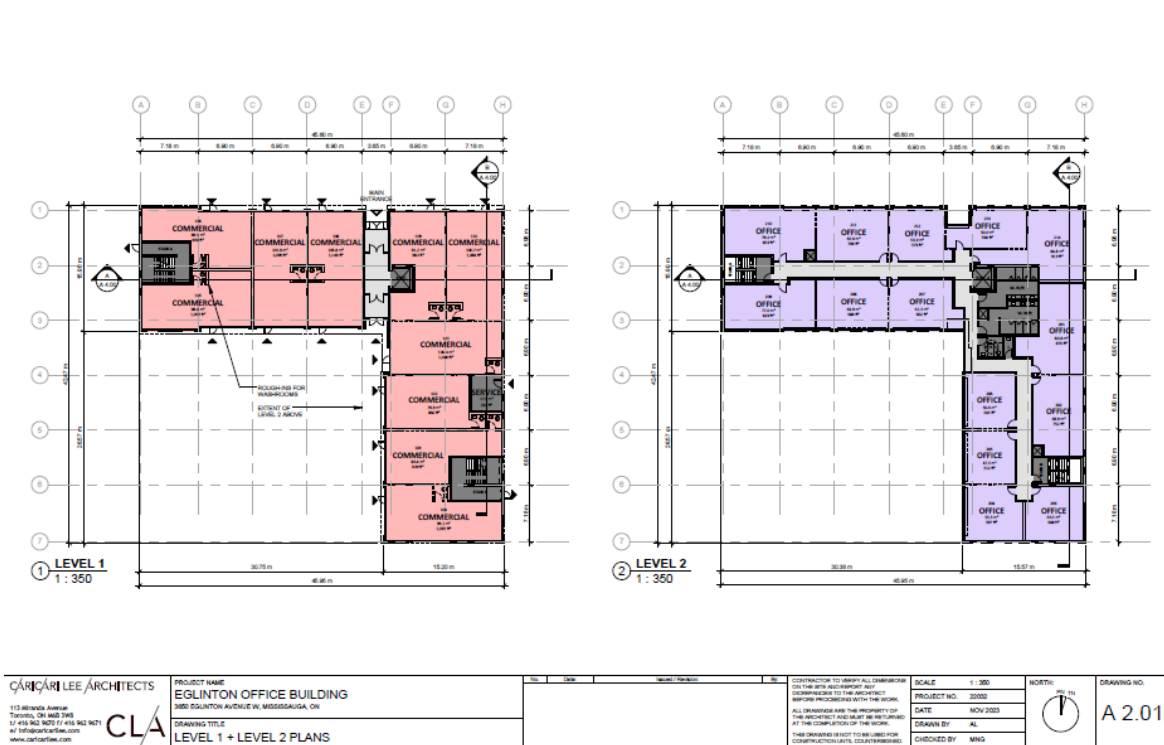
Plans of first and second storey interiors. (Plan from owner, November 2023.)
